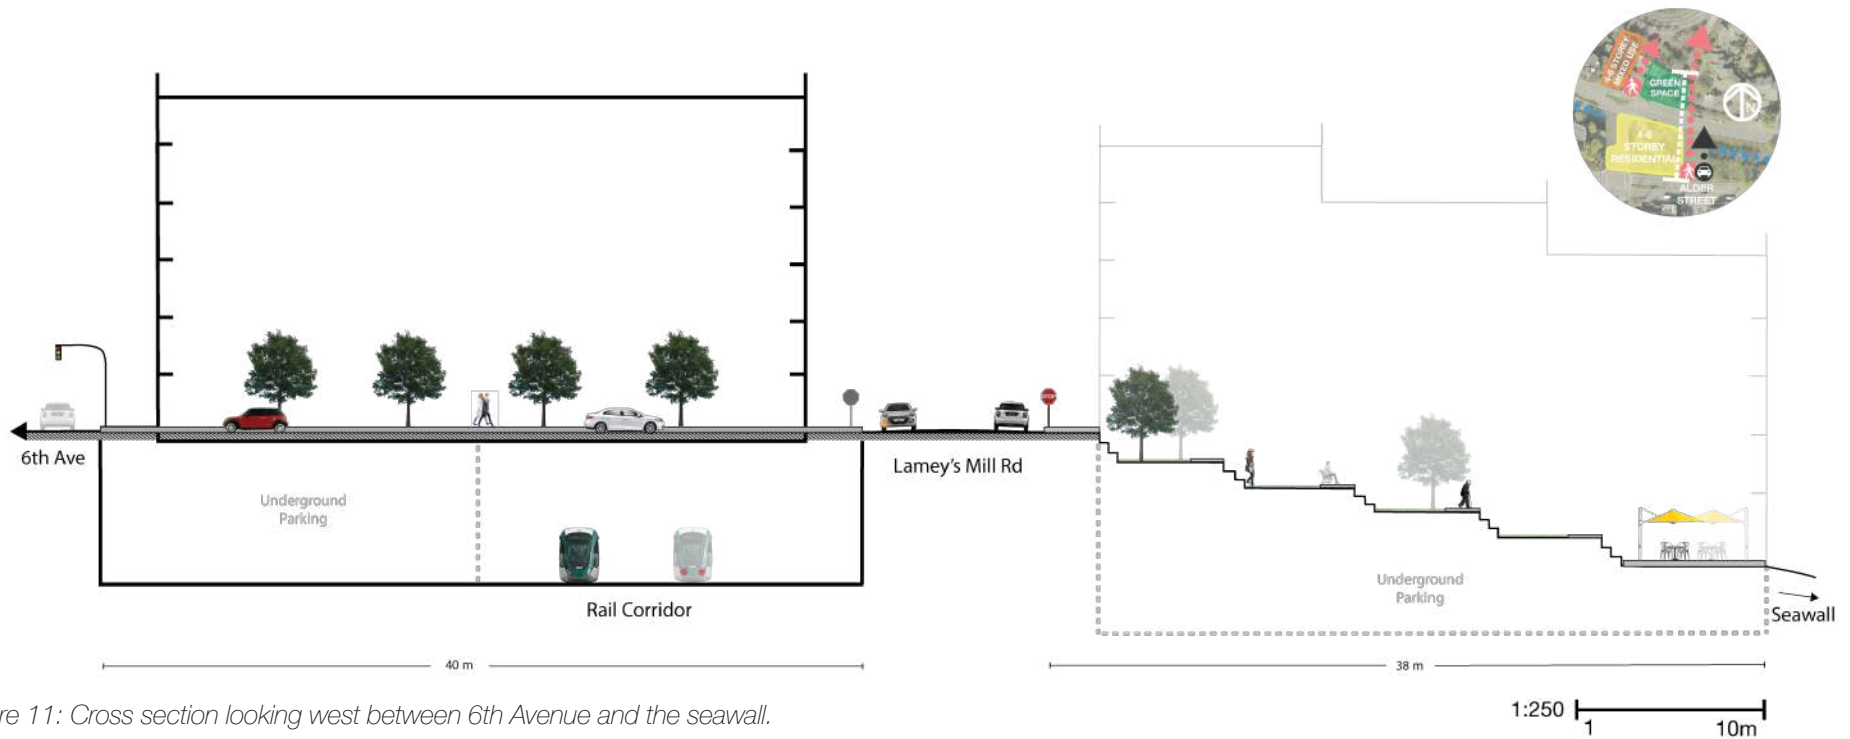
Cross section looking west between 6th Avenue and the seawall.
